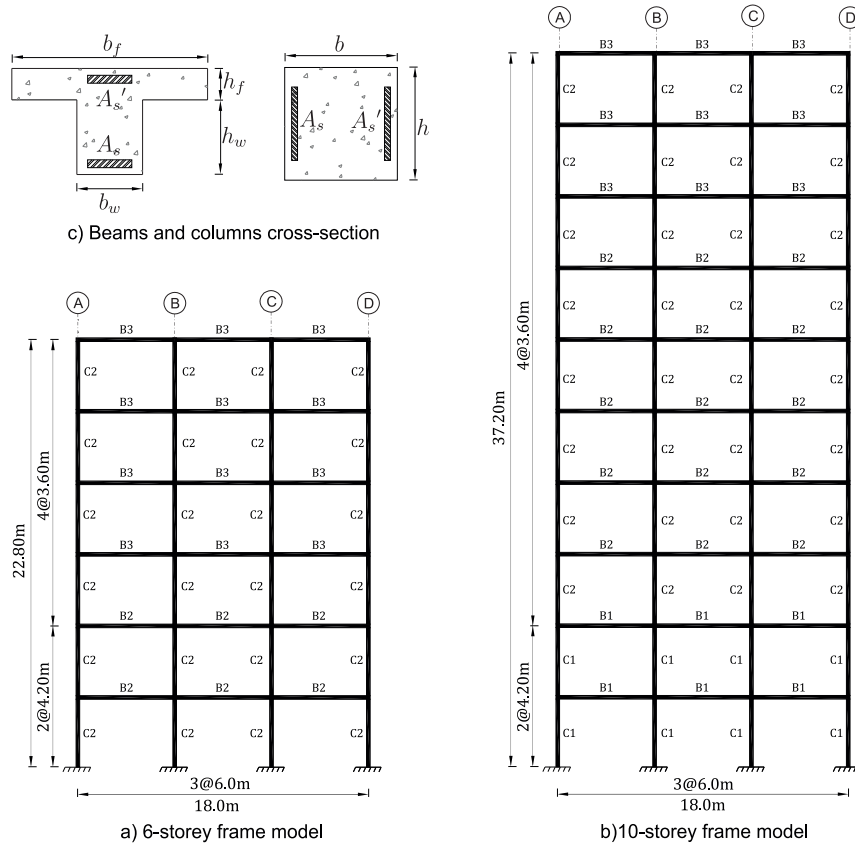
Elevation and cross-sections of low- and medium-rise RC frames.
